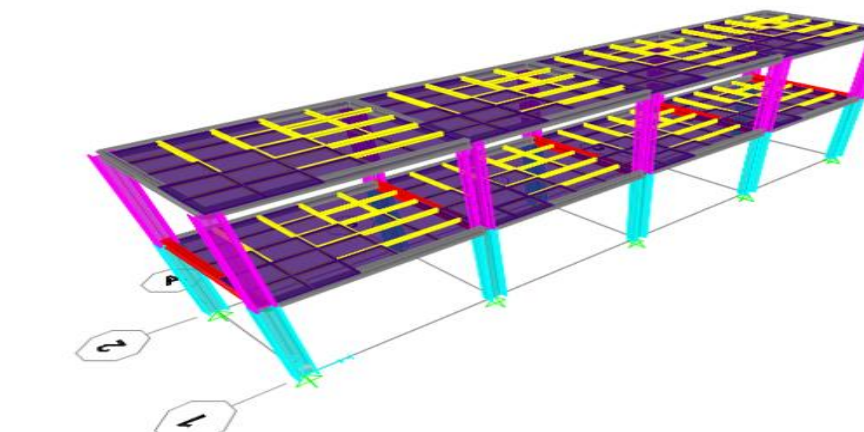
The structure in which the beam flanges are supported against bending and the webs against sliding
